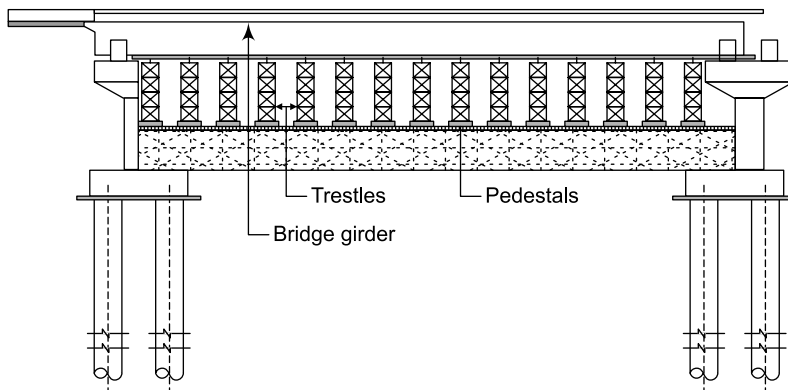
Trestles or Crib as Shoring for Bridge Girder.
